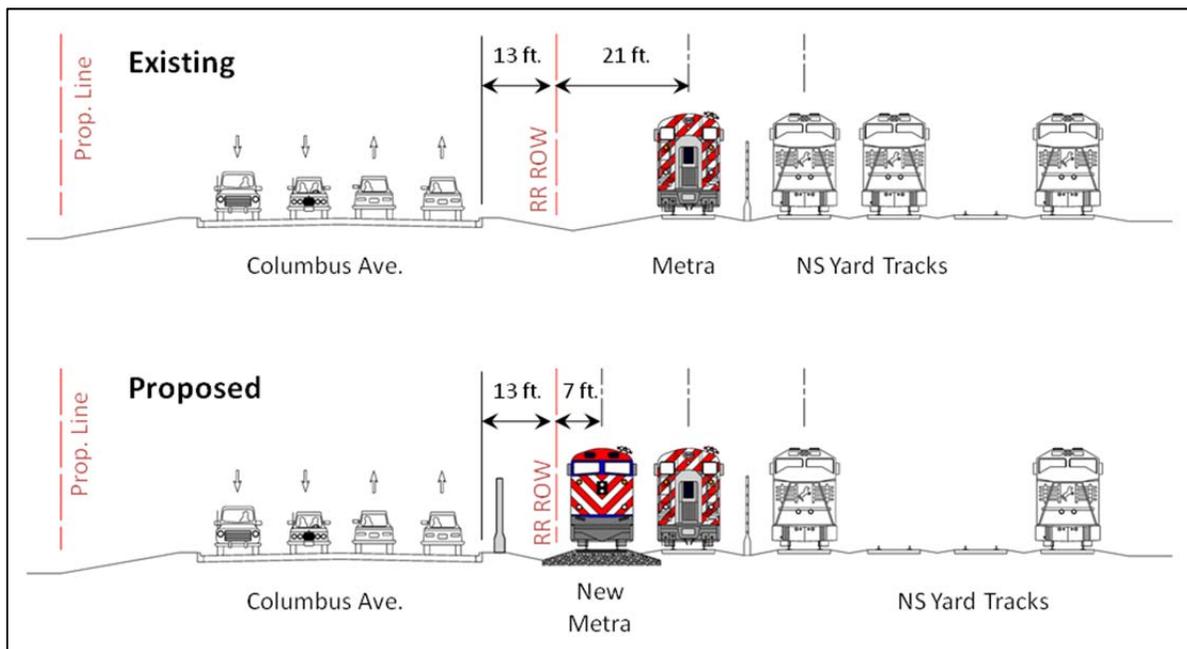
Alternate CA-1 and Existing Conditions, Looking Northeast along Columbus Avenue
